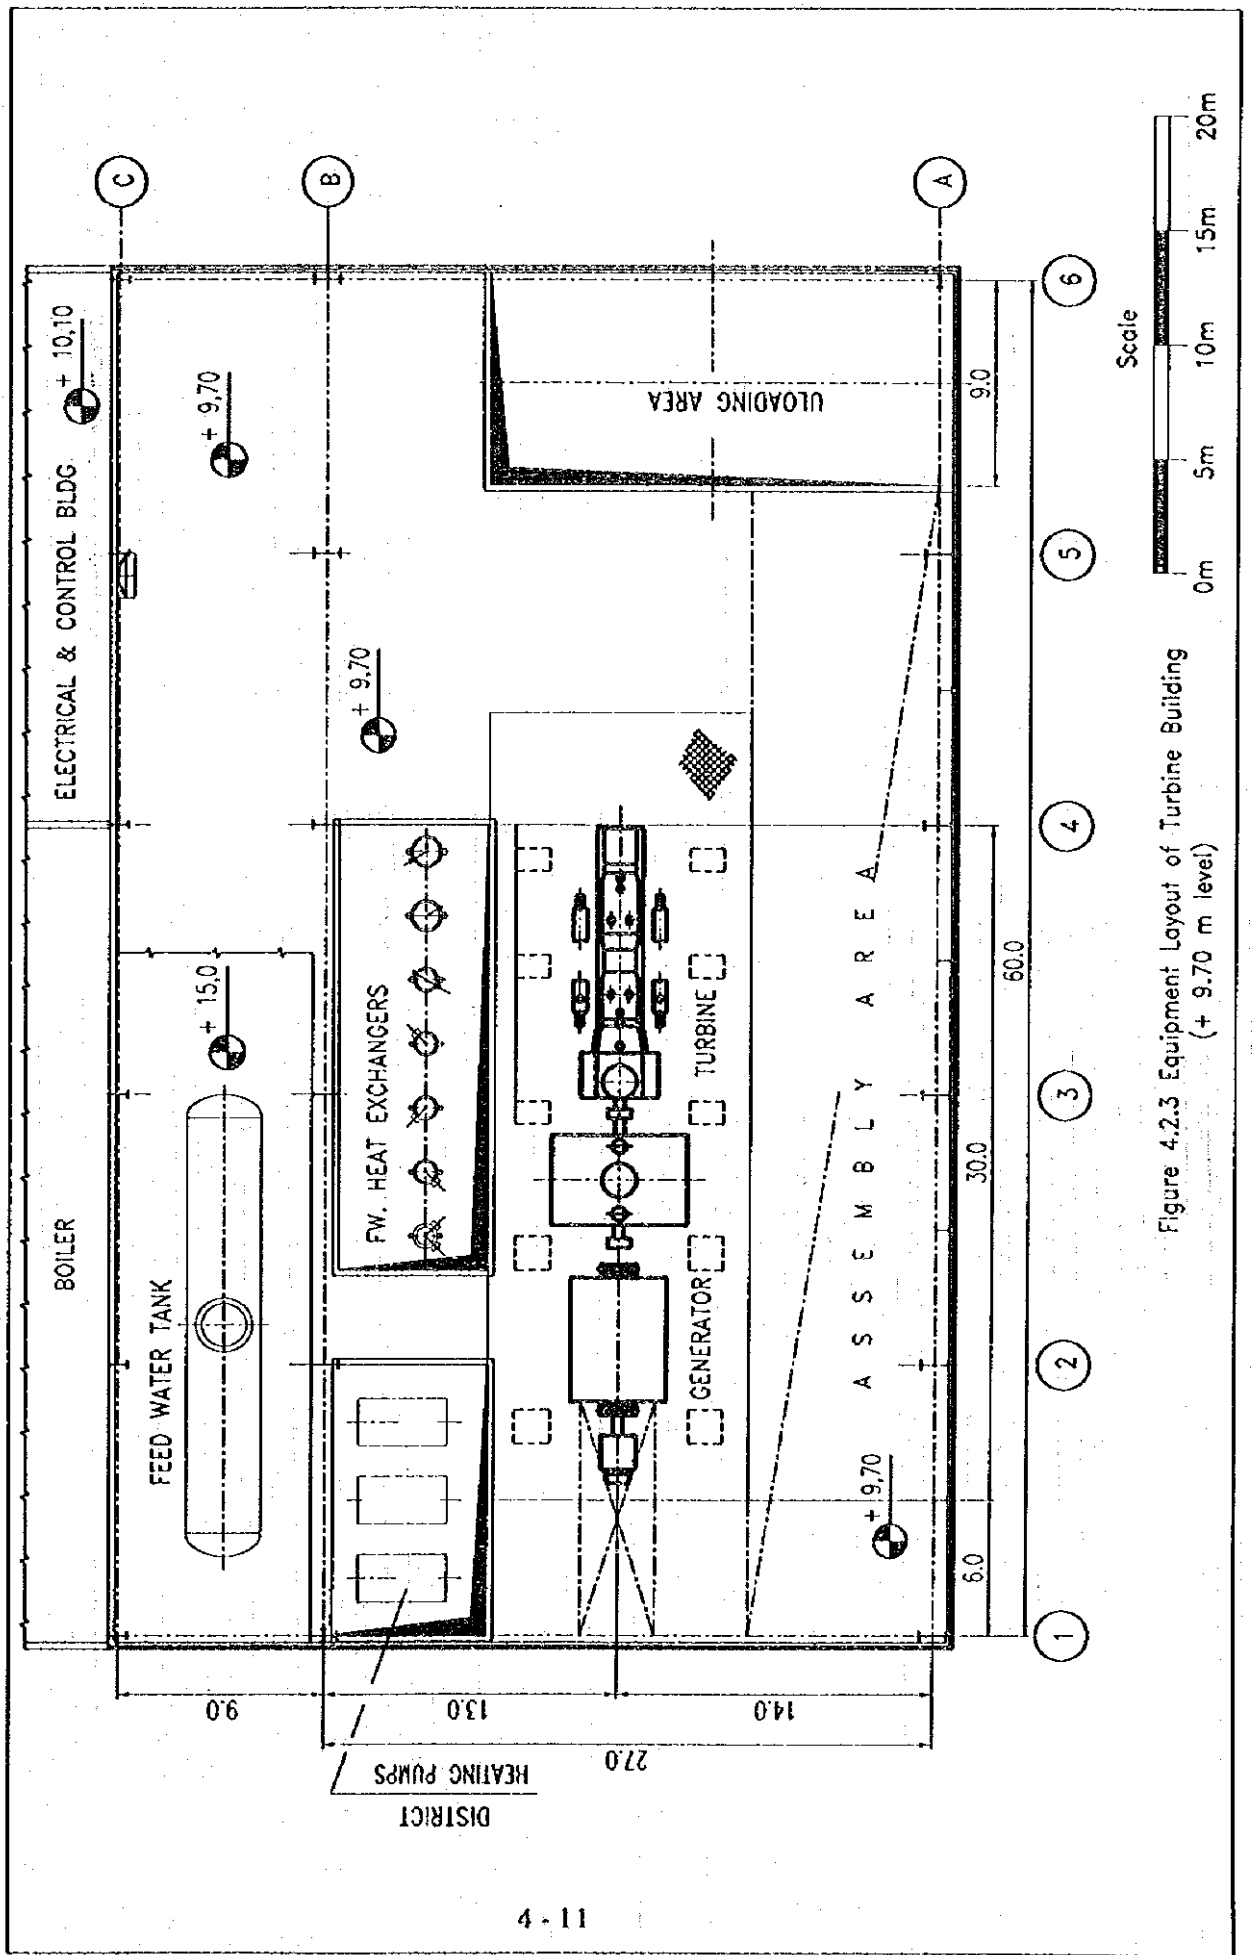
Equipment Layout of Turbine Building (+9.70 m level)
